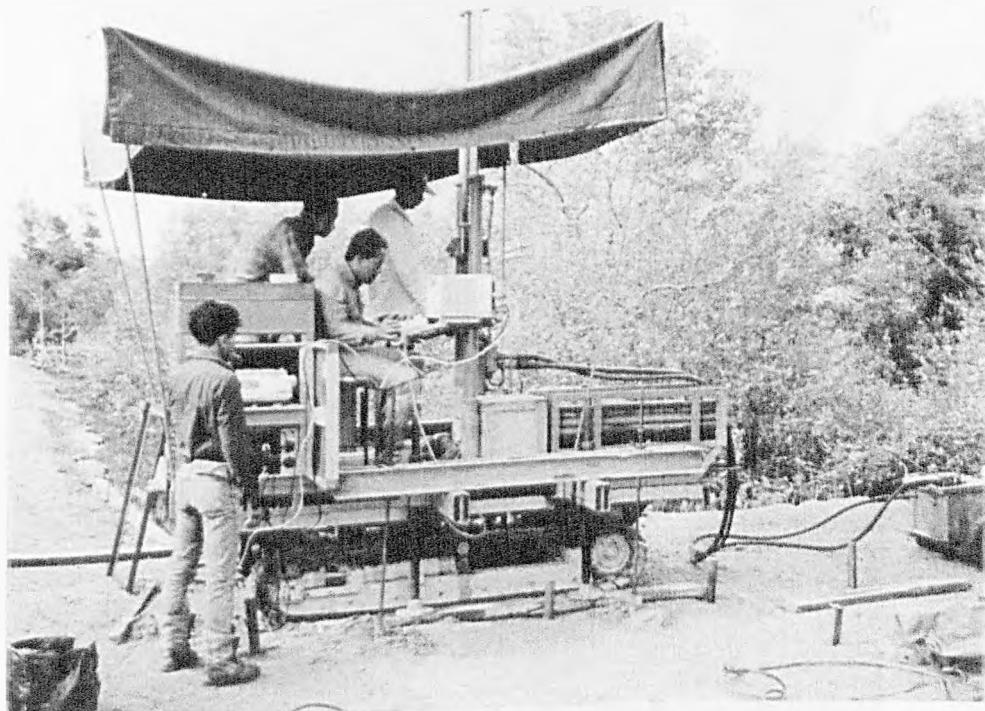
| Type of Machinery Used for Piezocone Testing in the South Trial Embankment
